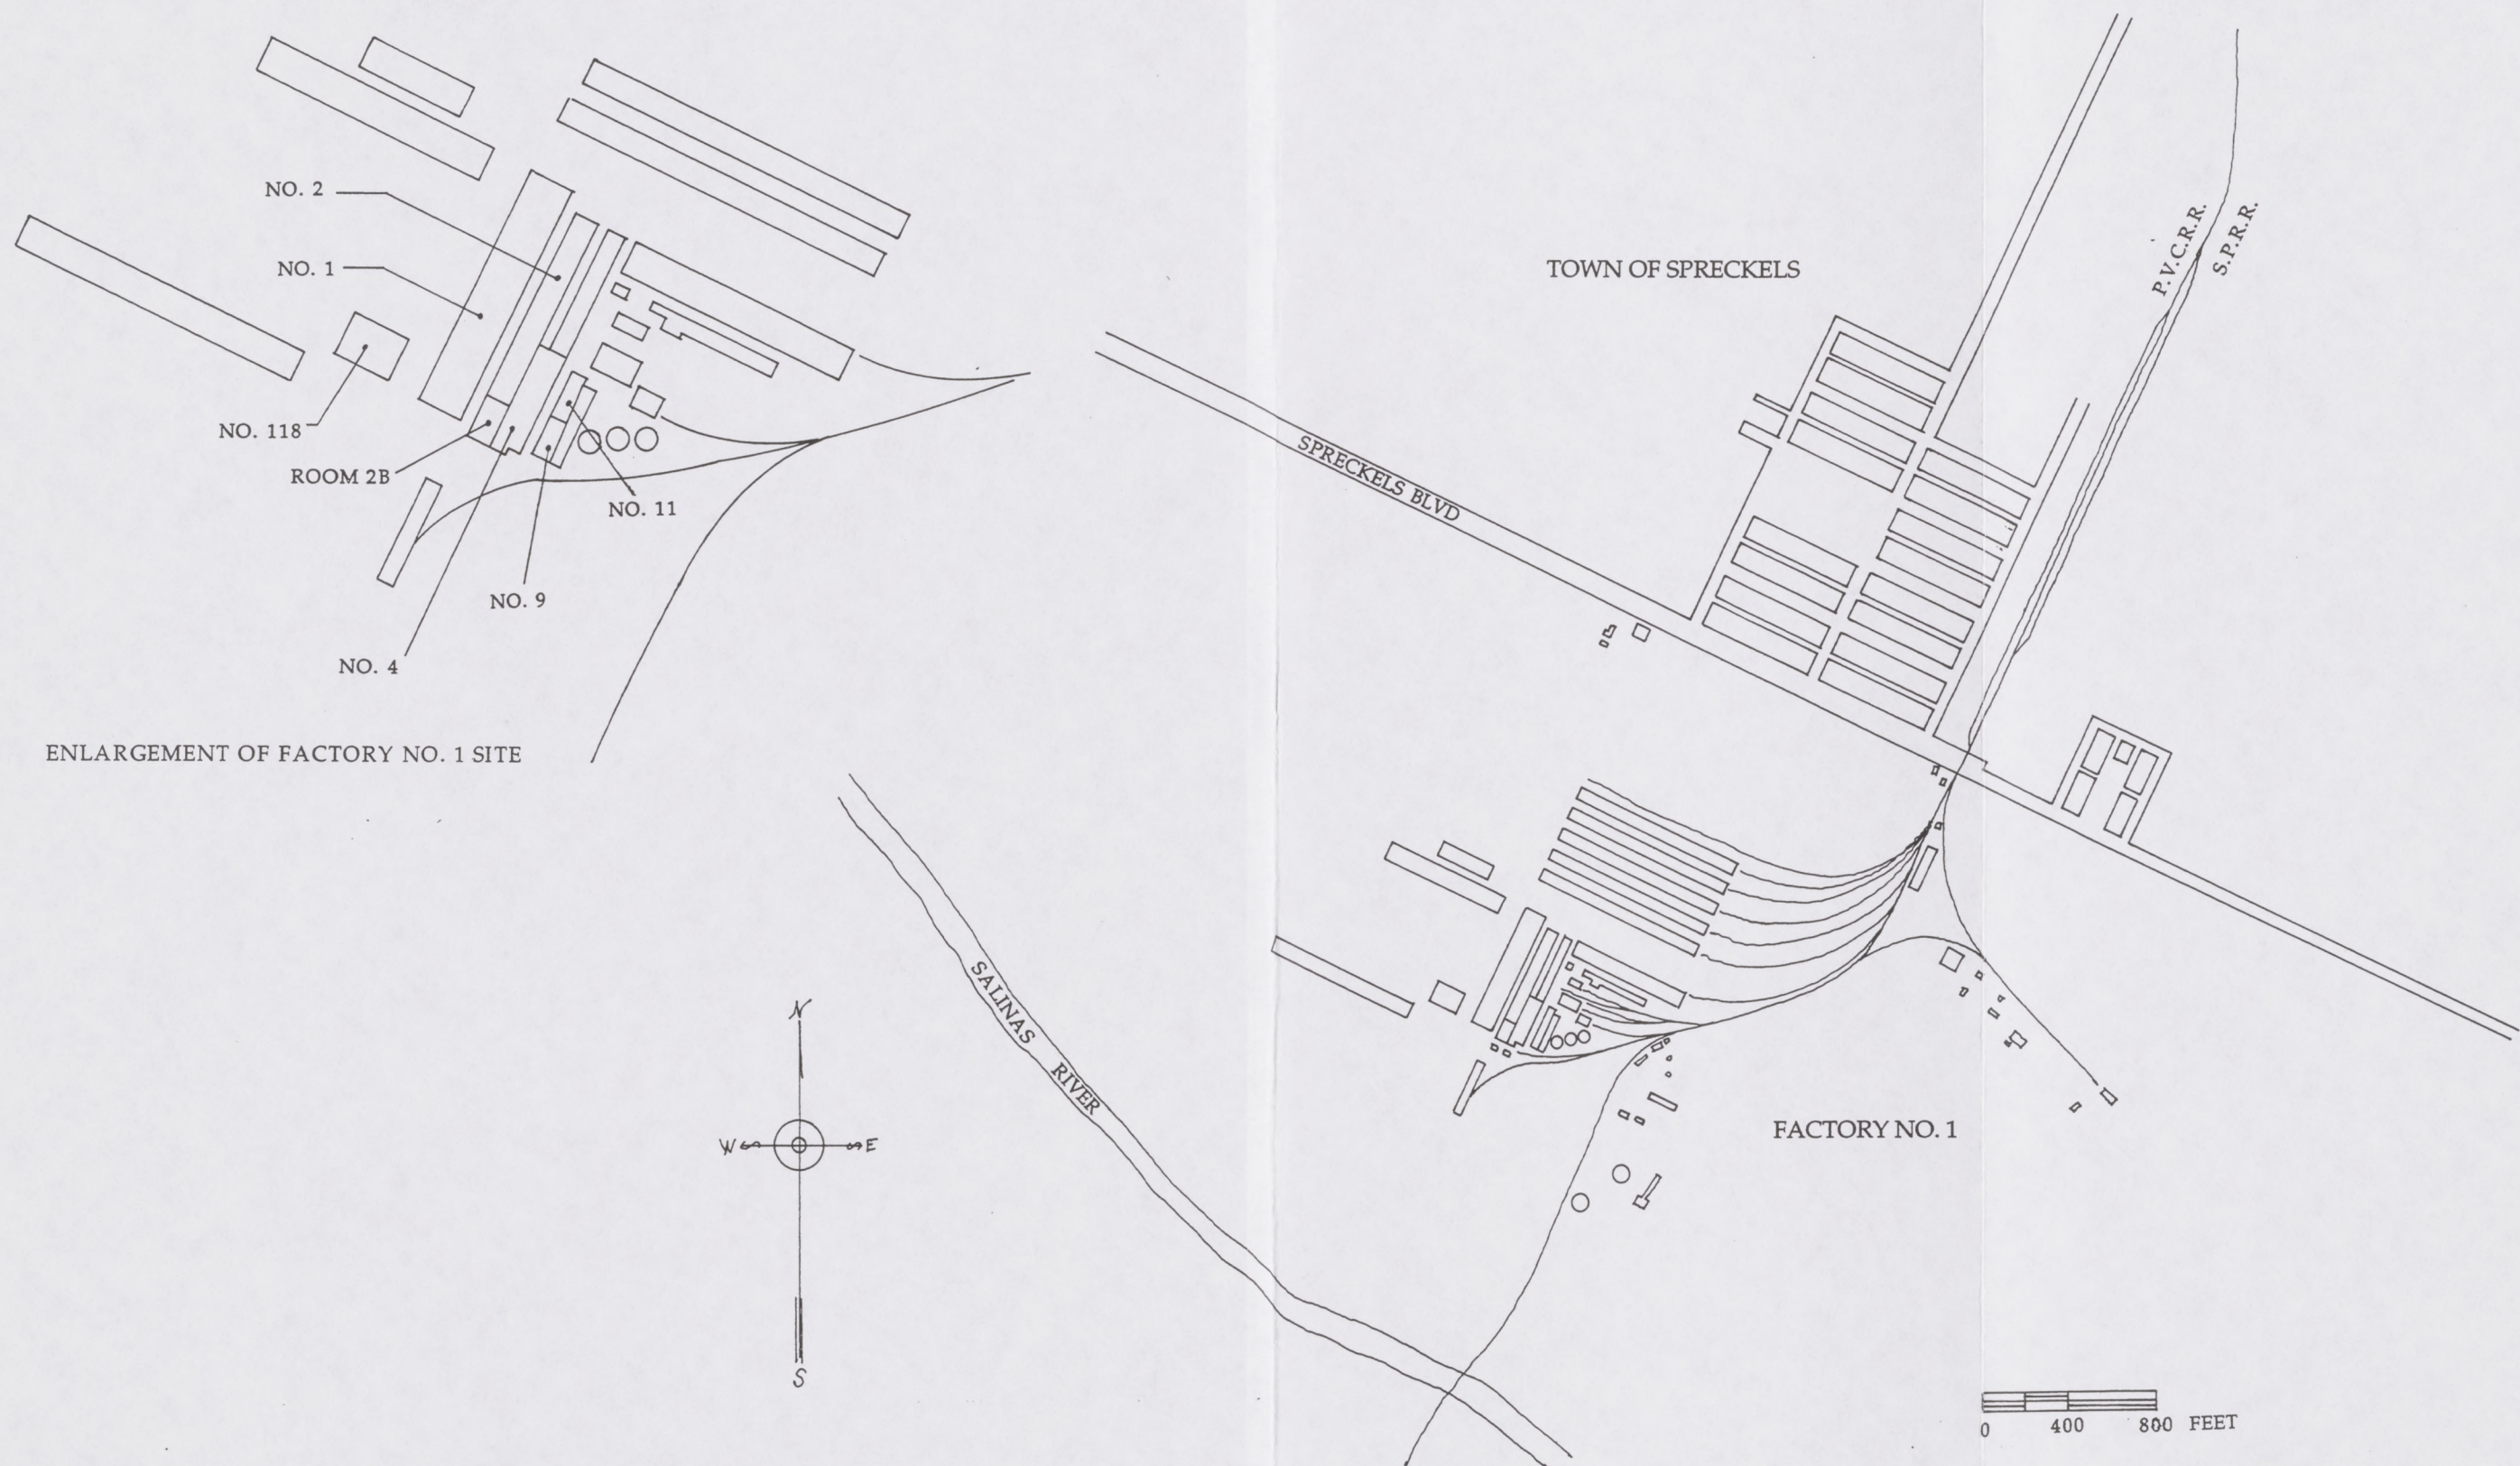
Factory No. 1 site and the Town of Spreckels with key plan for buildings to be demolished.
